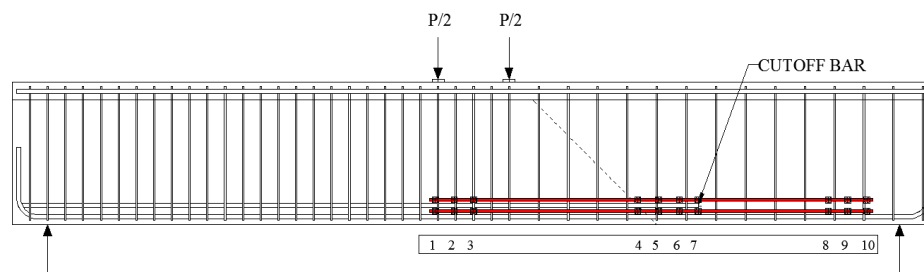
Instrumentation reference diagram sections 1-10
